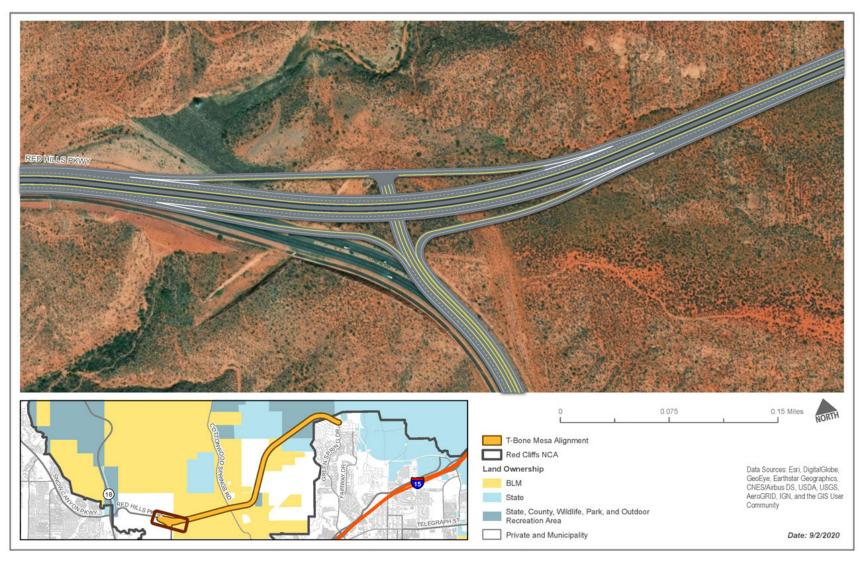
T-Bone Mesa Alignment Plan View (1 of 8)
